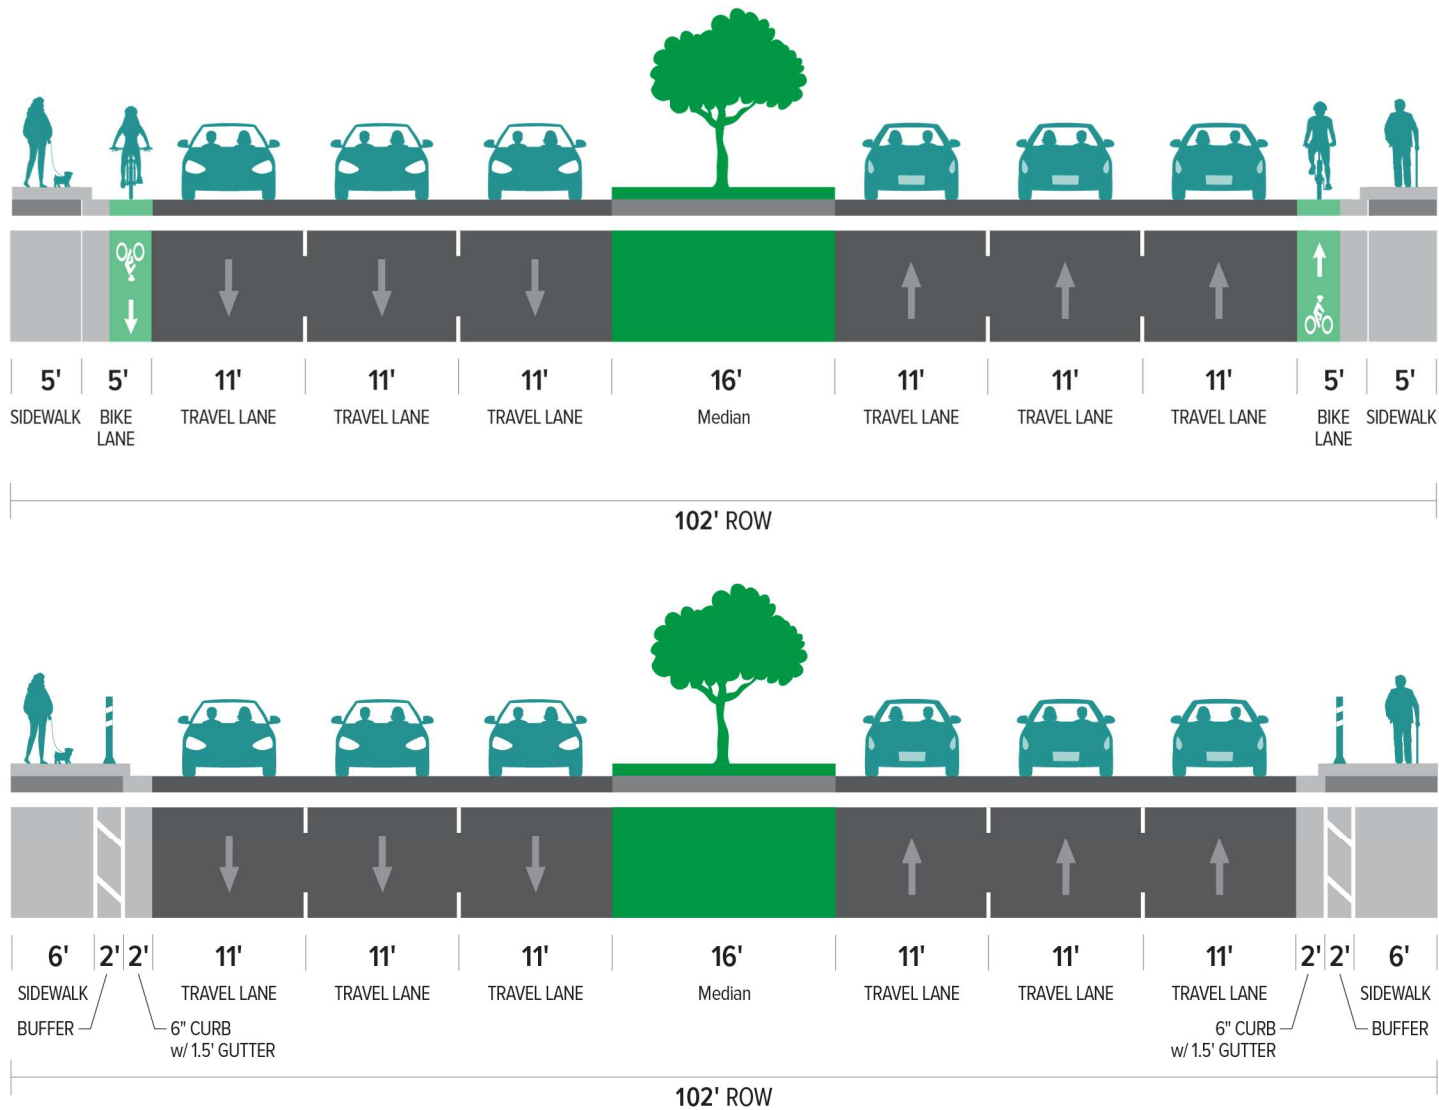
Existing Cross Section (Top) and Proposed Alternative 1 Cross-Section (Bottom)
